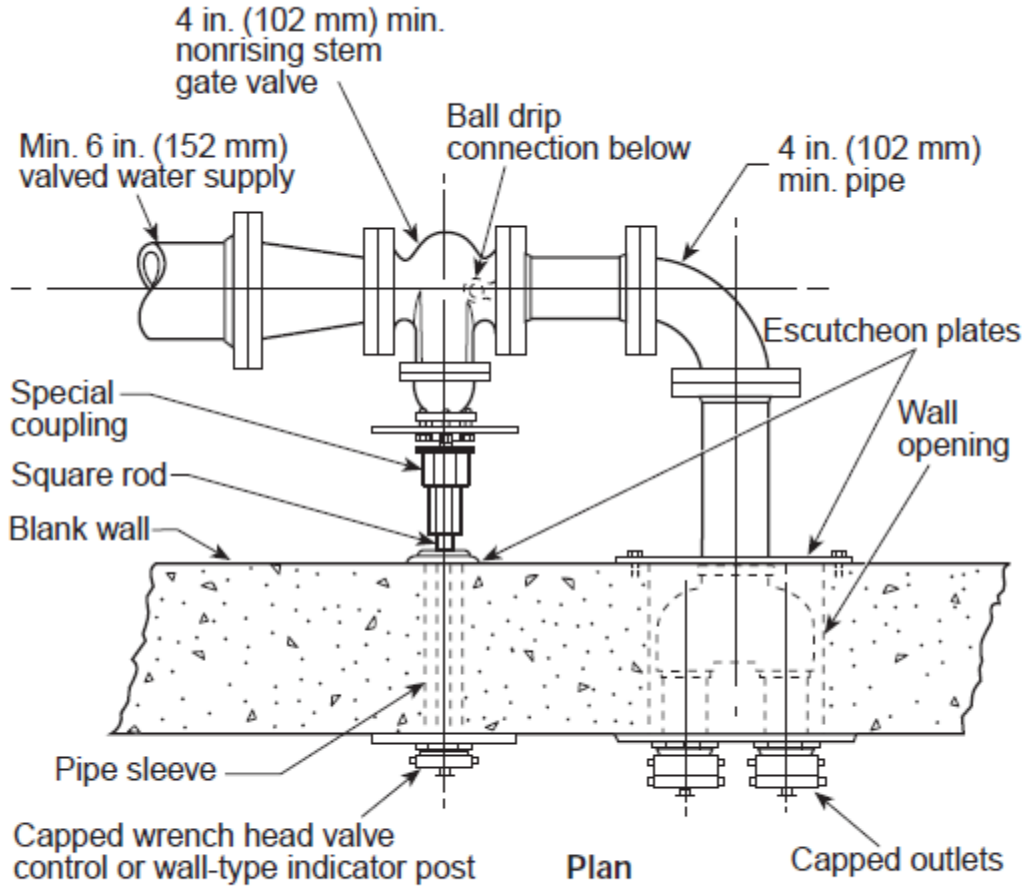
Typical Wall Fire Hydrant Installation.
